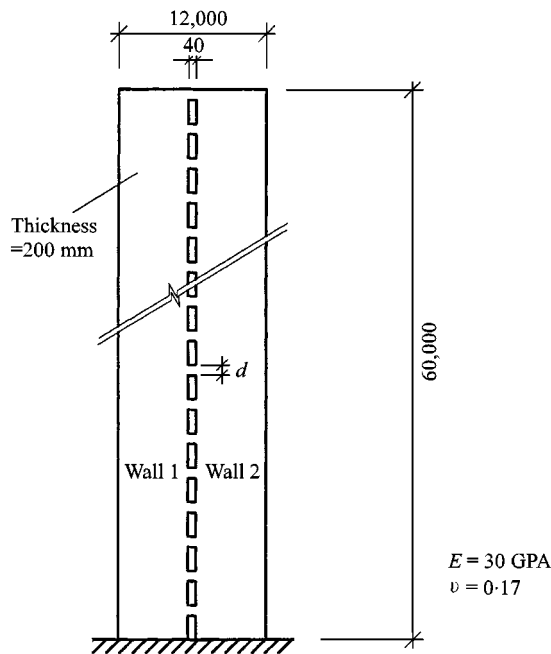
Slit shear wall structure analyzed (all dimensions in mm).
